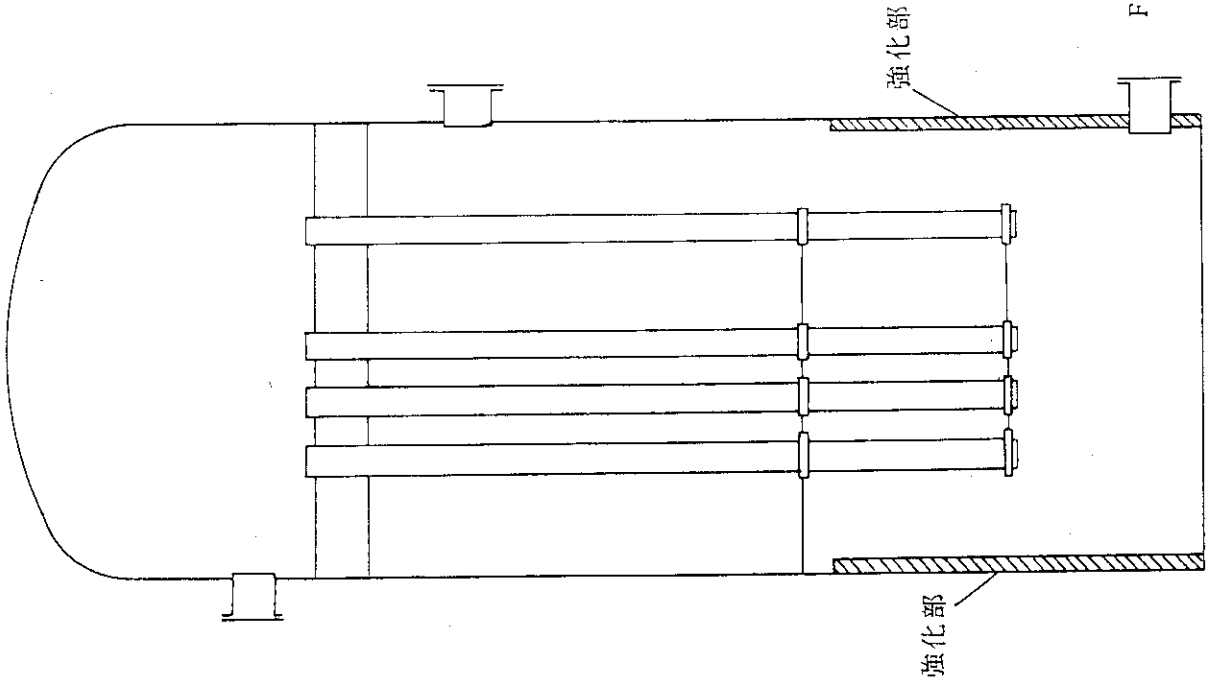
Masses of concrete inside wetwell and wall liner plates
